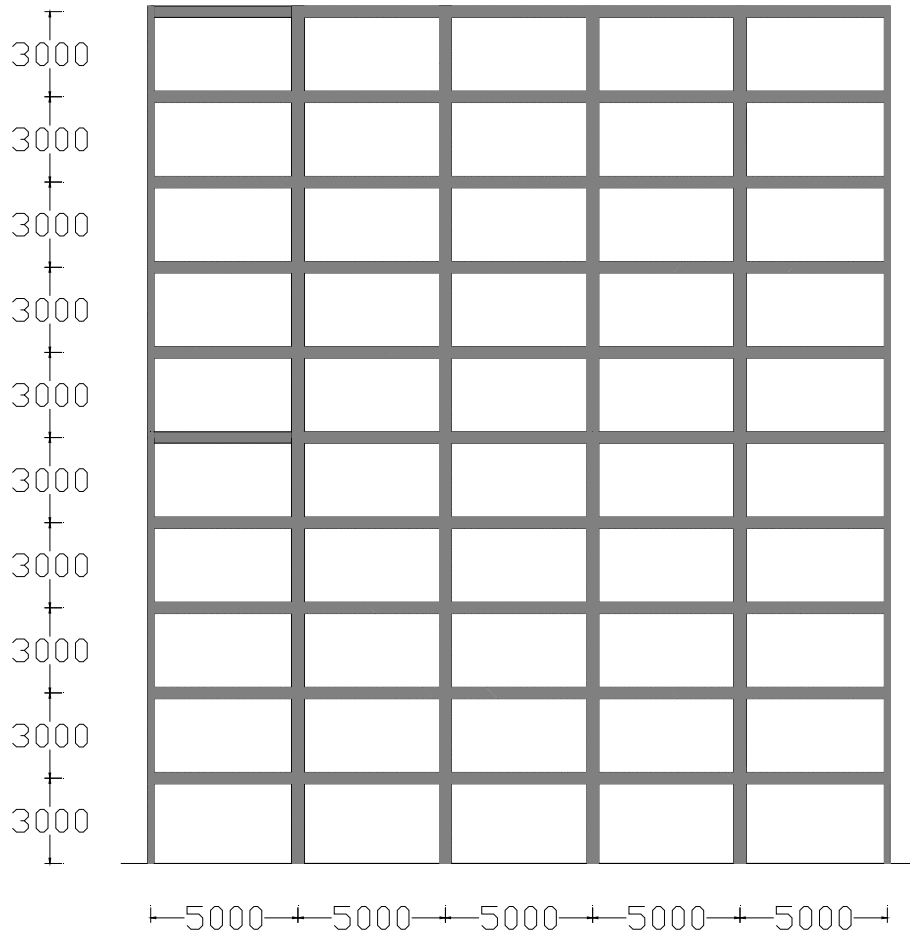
Elevation of building model 2 used for this study (dimension is in mm)
